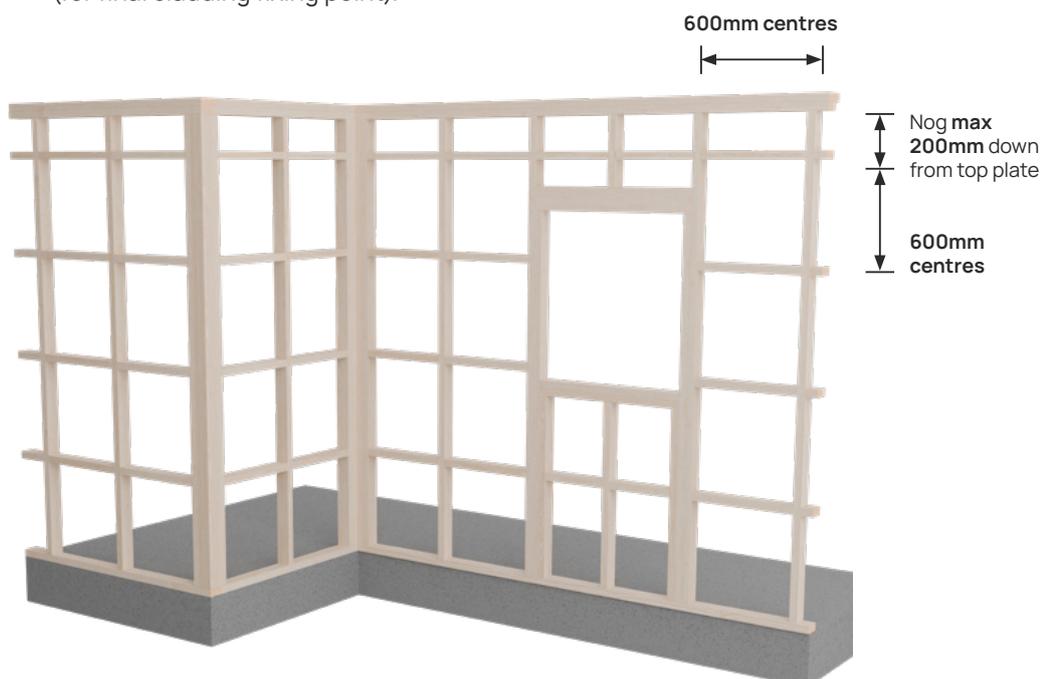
TYPICAL FRAMING CONFIGURATION FOR VERTICAL CLADDING
